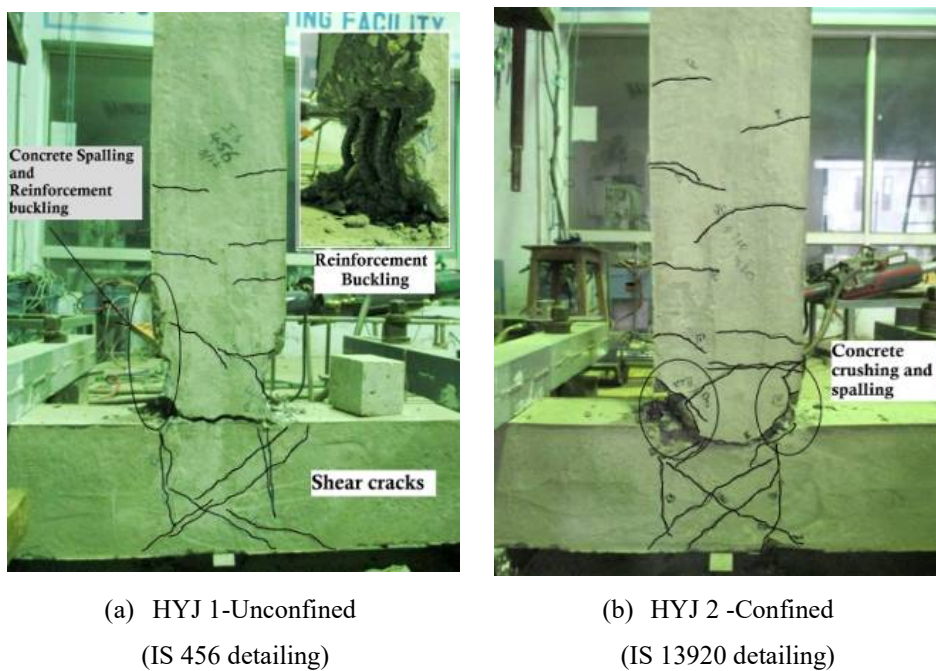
Failure pattern of conventional specimens HYJ 1 and HYJ 2
